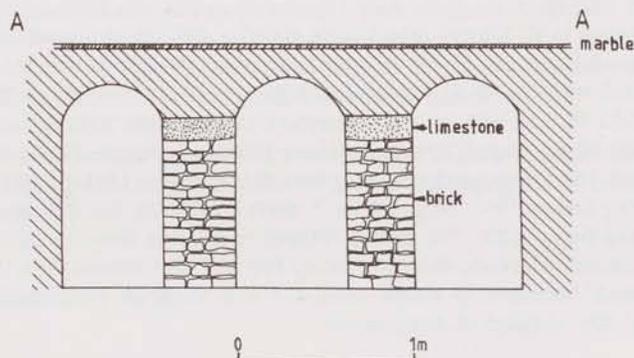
Nazareth (No. 103). Bath house section through hypocaust.
